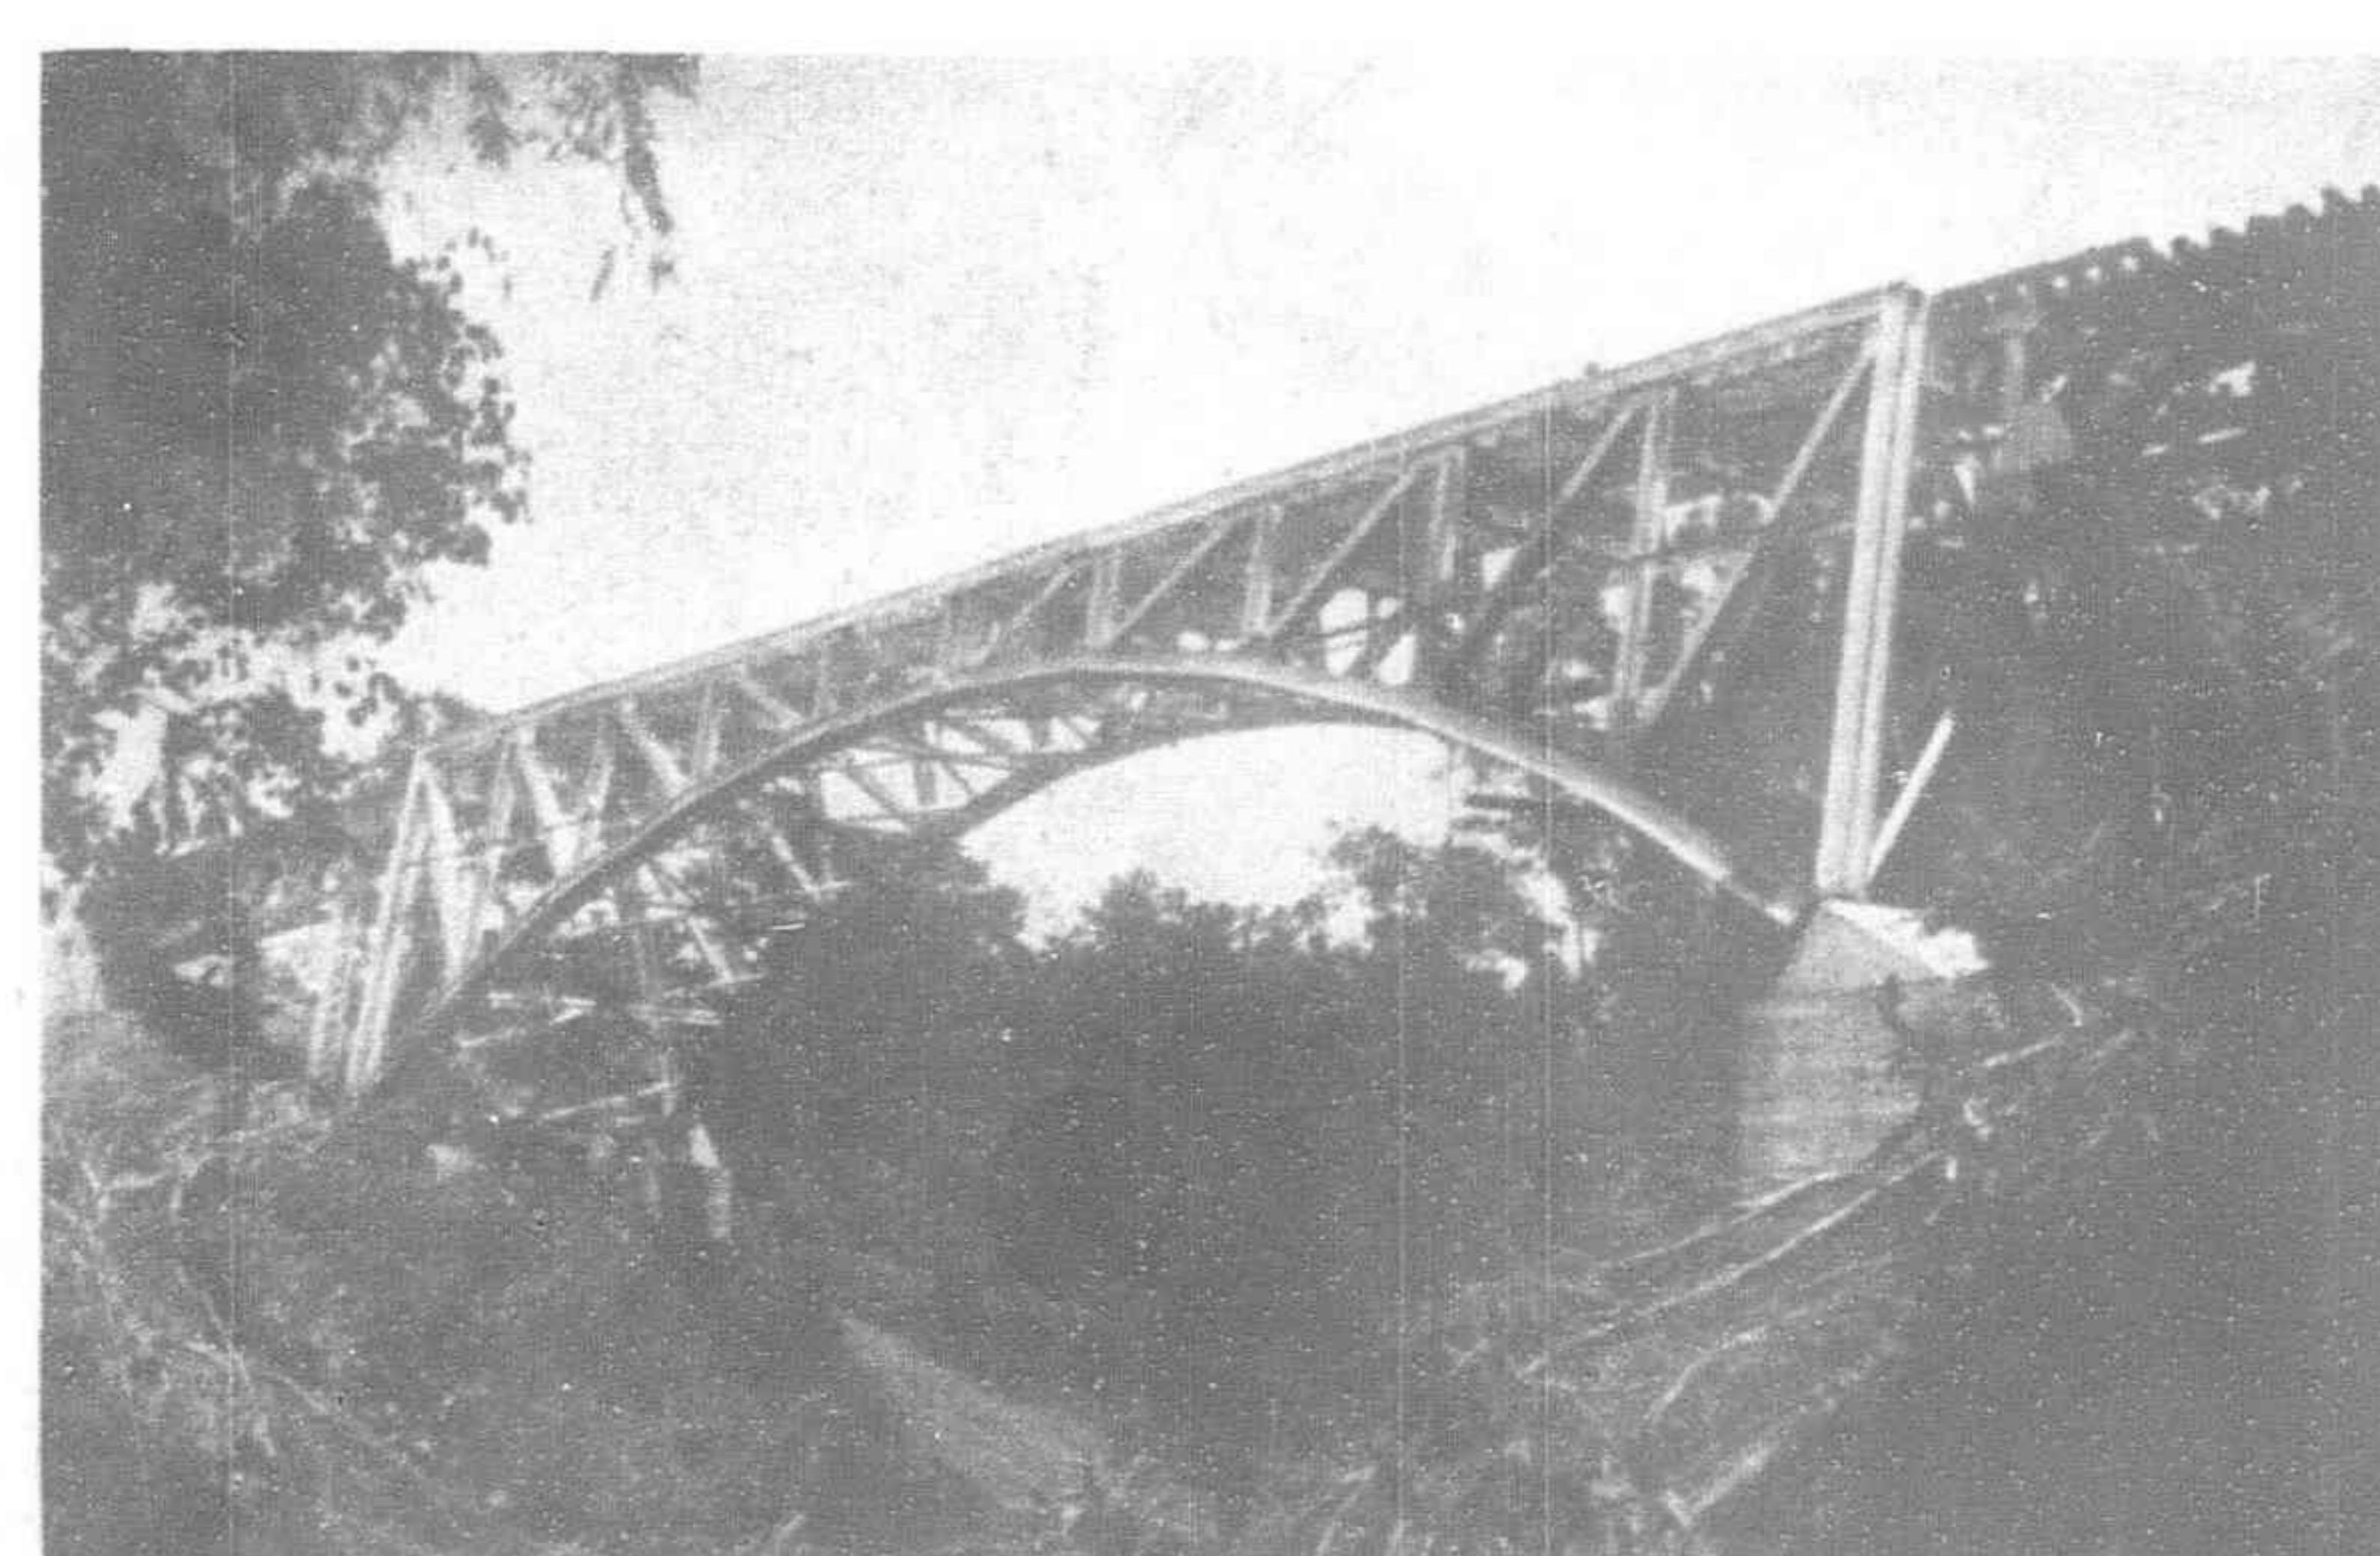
Malagatas Bridge, 40 Meter Arch, Approaches 2-60-ft. Deck Trusses from Old Stock
